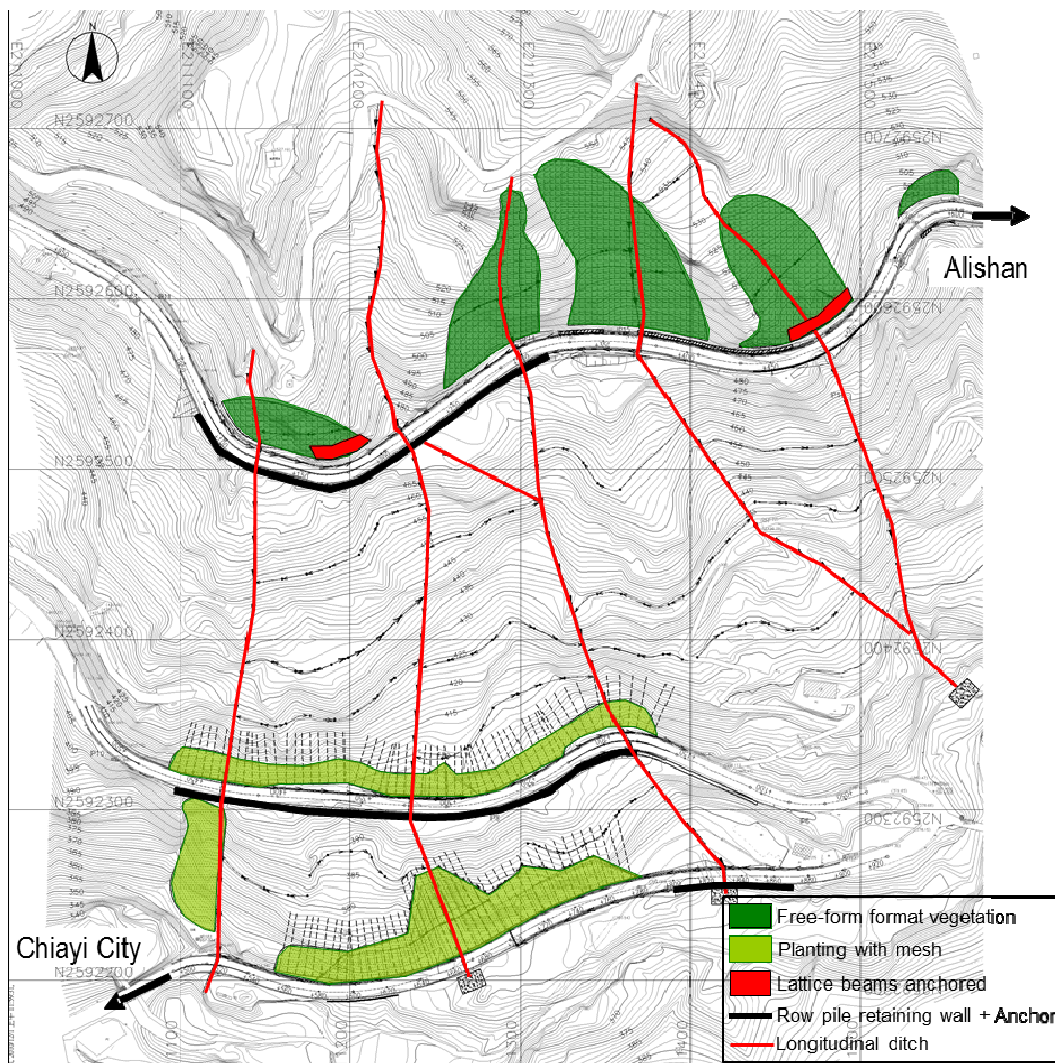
Layout of repair works at Mileage 37.5k ~40.1k of Alishan Route 18
